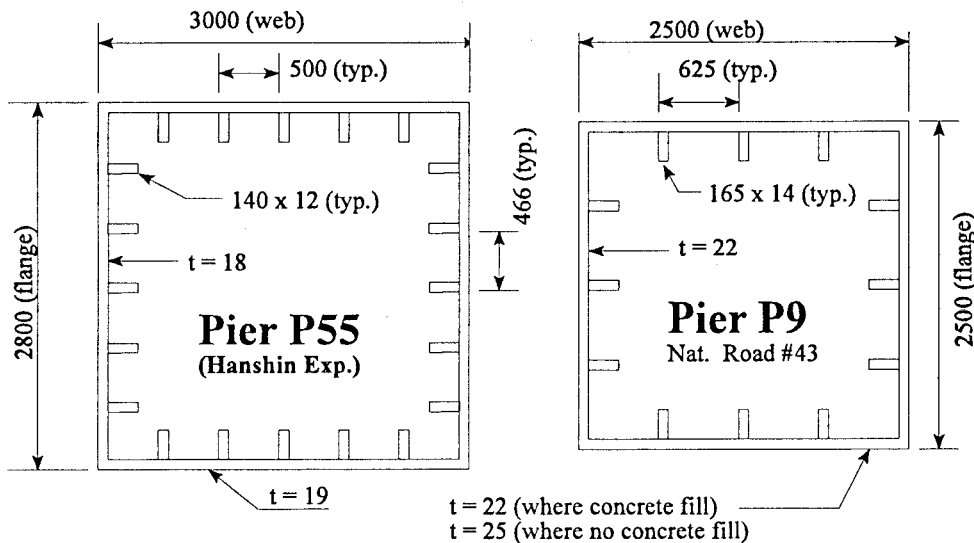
Details of cross sections of Pier 55 of Hanshin Expressway and Pier 9 of National Road 43.
